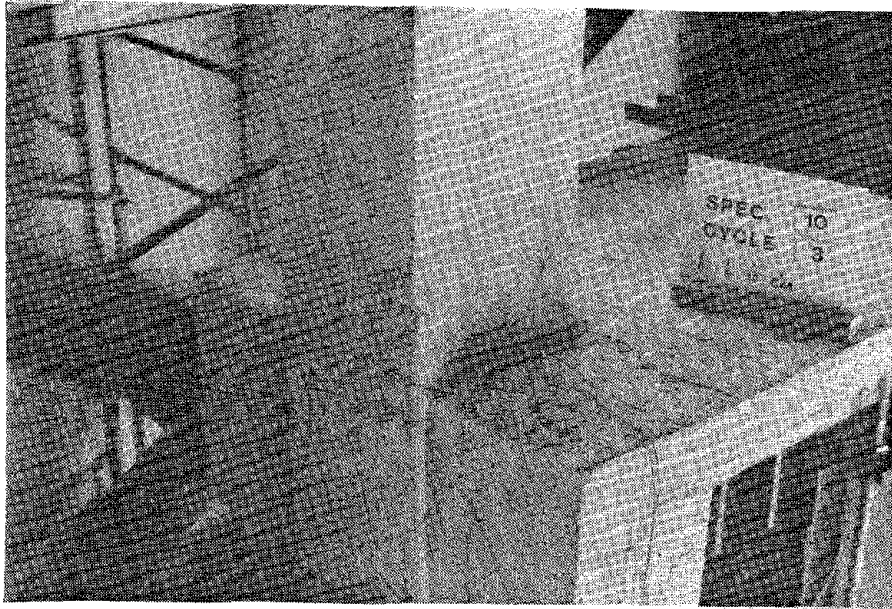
Torsional Cracks in the Transverse Beams and Columns of Specimens with Slab.
